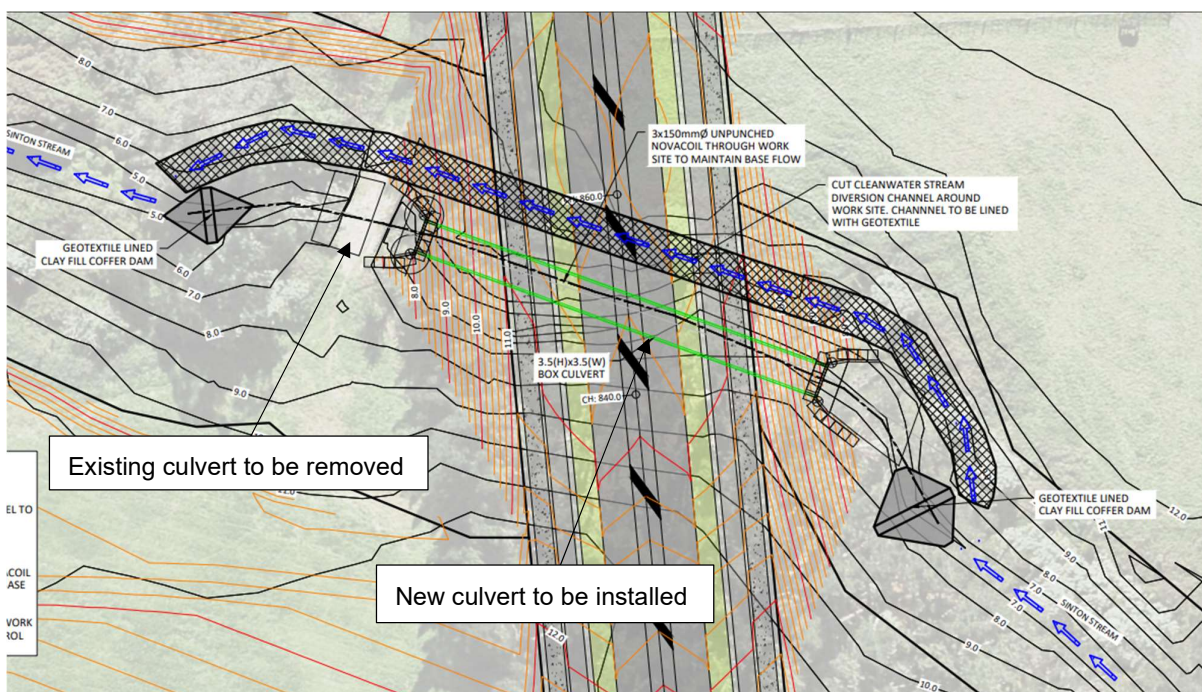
Temporary stream diversion plan for Sinton Stream culvert installation (snip from Drawing No. SK016B, Crang Civil Consulting Engineers, provided in Appendix A).
